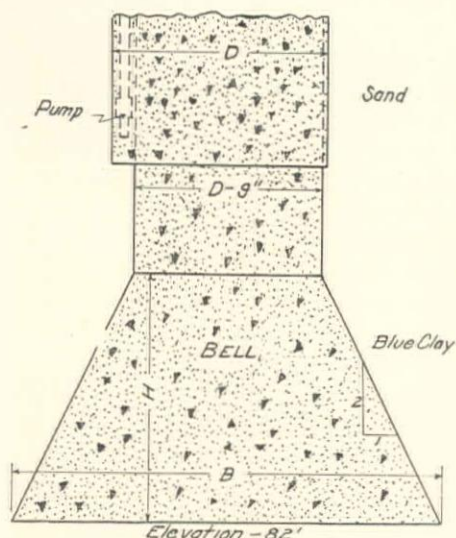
Typical Section Showing Dimensions of Caisson Bell and Arrangement of Pump for Unwatering Hole
